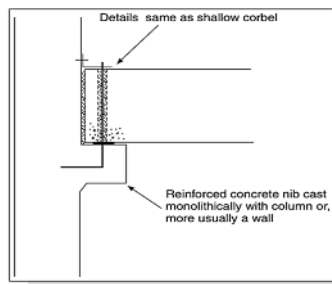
Nib beam-to-column (or wall) visible connection.
